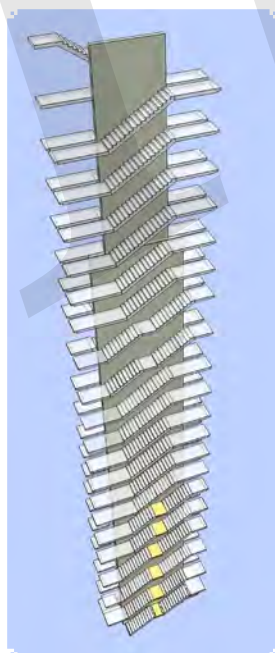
Stair arrangement that incorporates a central precast concrete spine wall.
